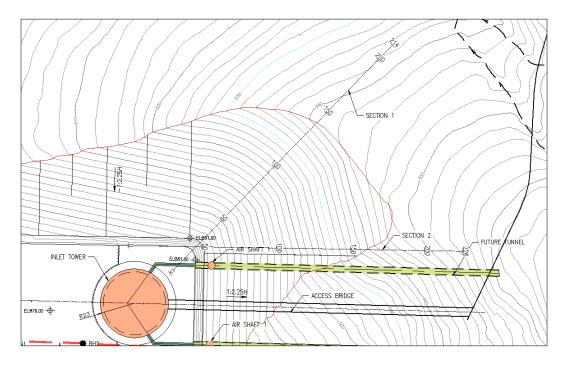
Plan view of the tunnel inlet portal showing Section 01 and Section 02
